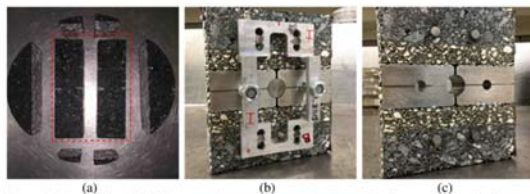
Assembly of CSIC composite specimen: (a) Cutting to obtain two symmetrical parts (plan view), (b) Two symmetrical parts aligned and glued to the central metal spacer, and (c) Complete CSIC specimen installed with gauge points.
